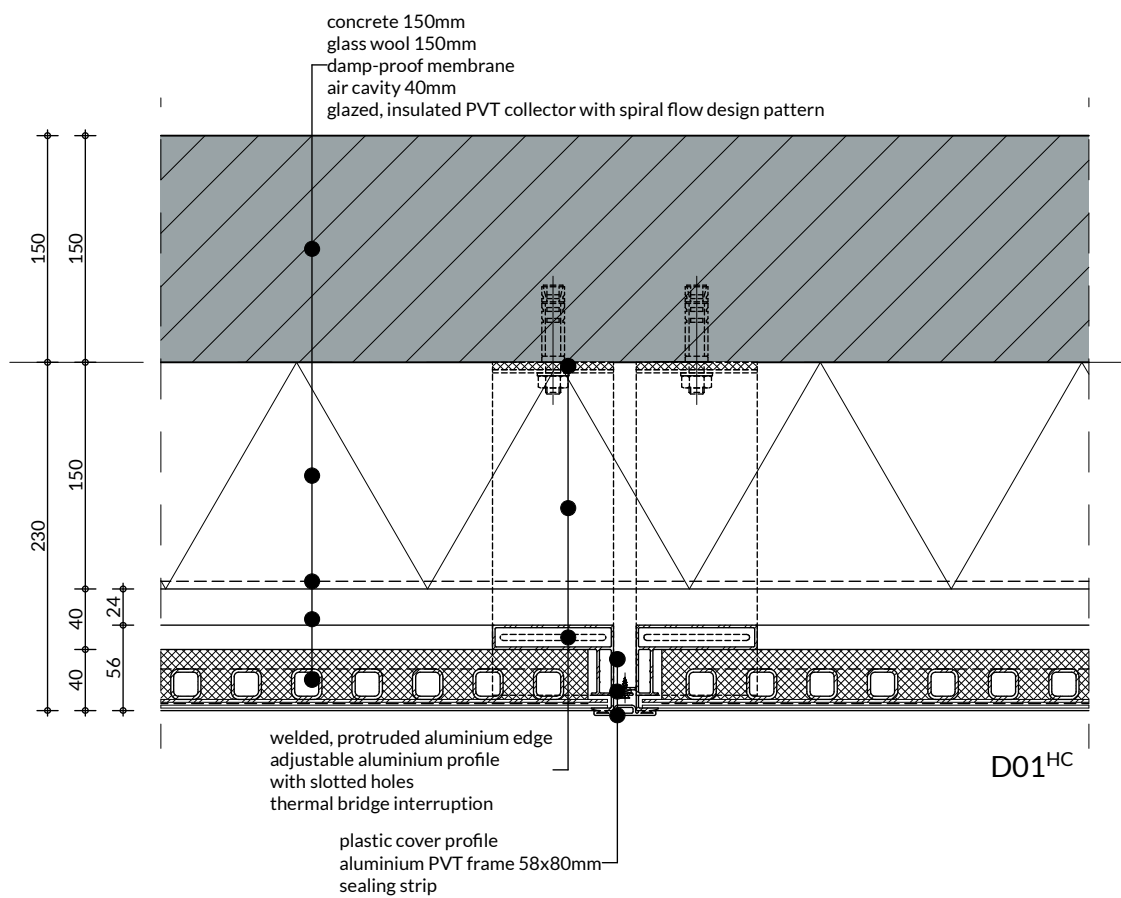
Cavity wall detail D01^{HC}, with the mutual PVT connection (scale 1:5; own illustration).
